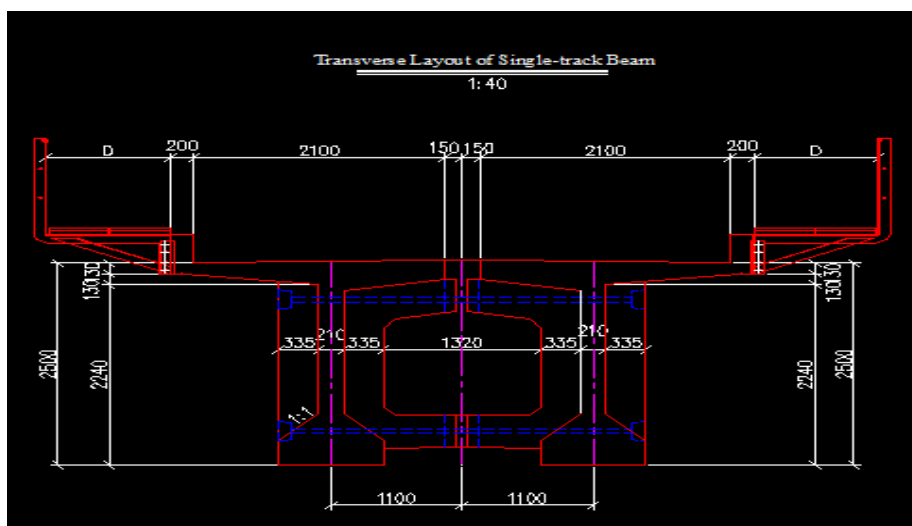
Sebeta-Meisso rail way line project single track bridge section layout
